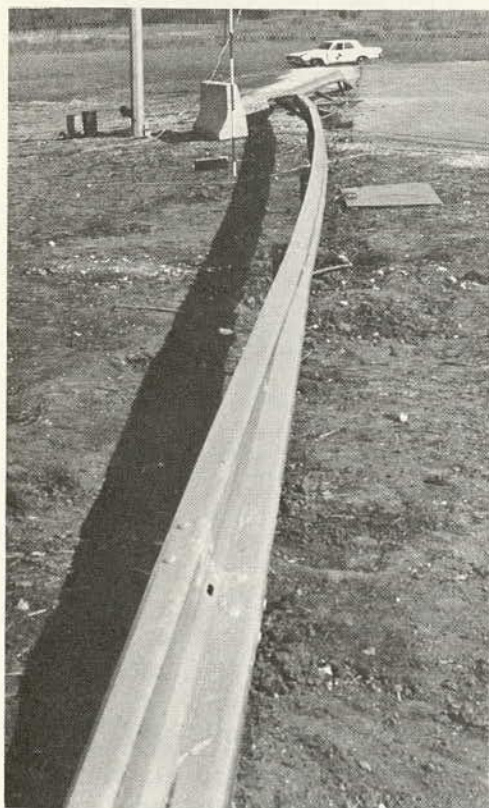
Guardrail and vehicle damage, Test 105.
